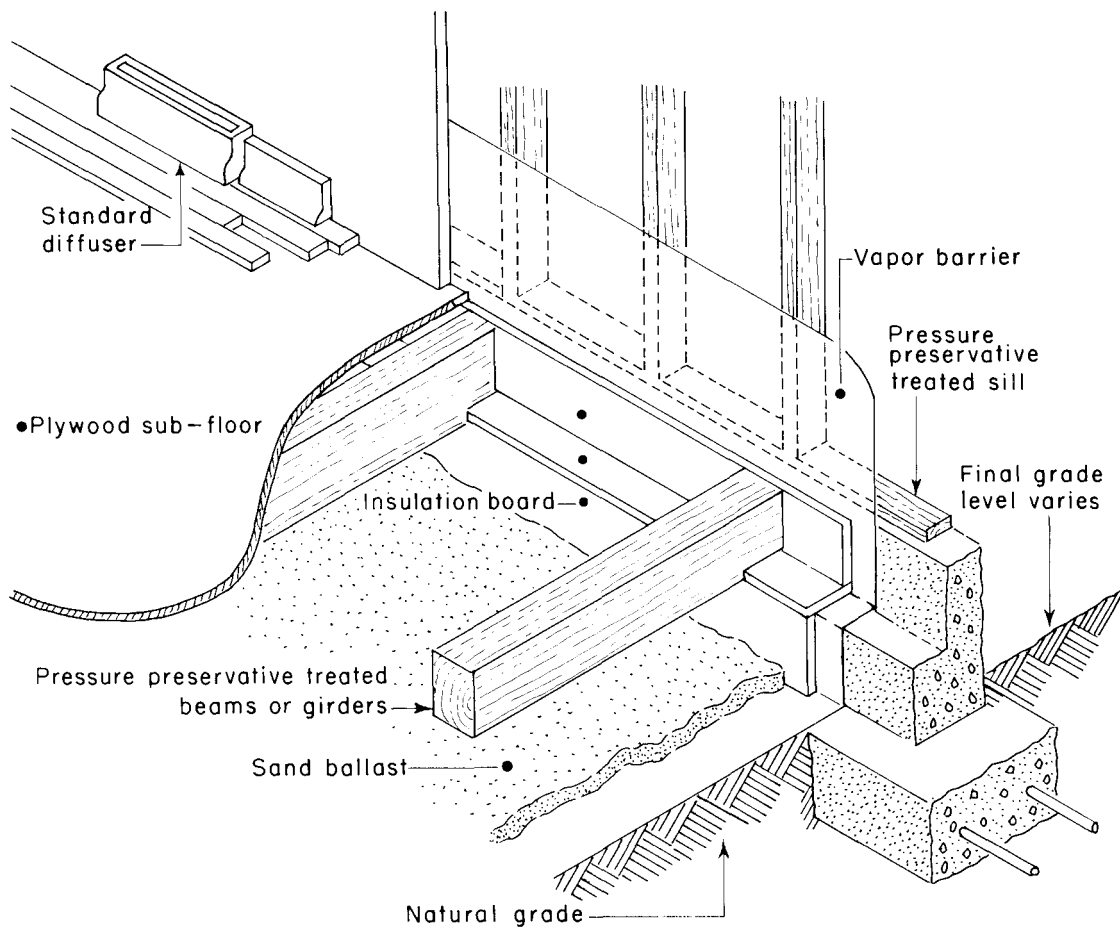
A wood floor construction has been designed for use in combination with an underfloor plenum.
